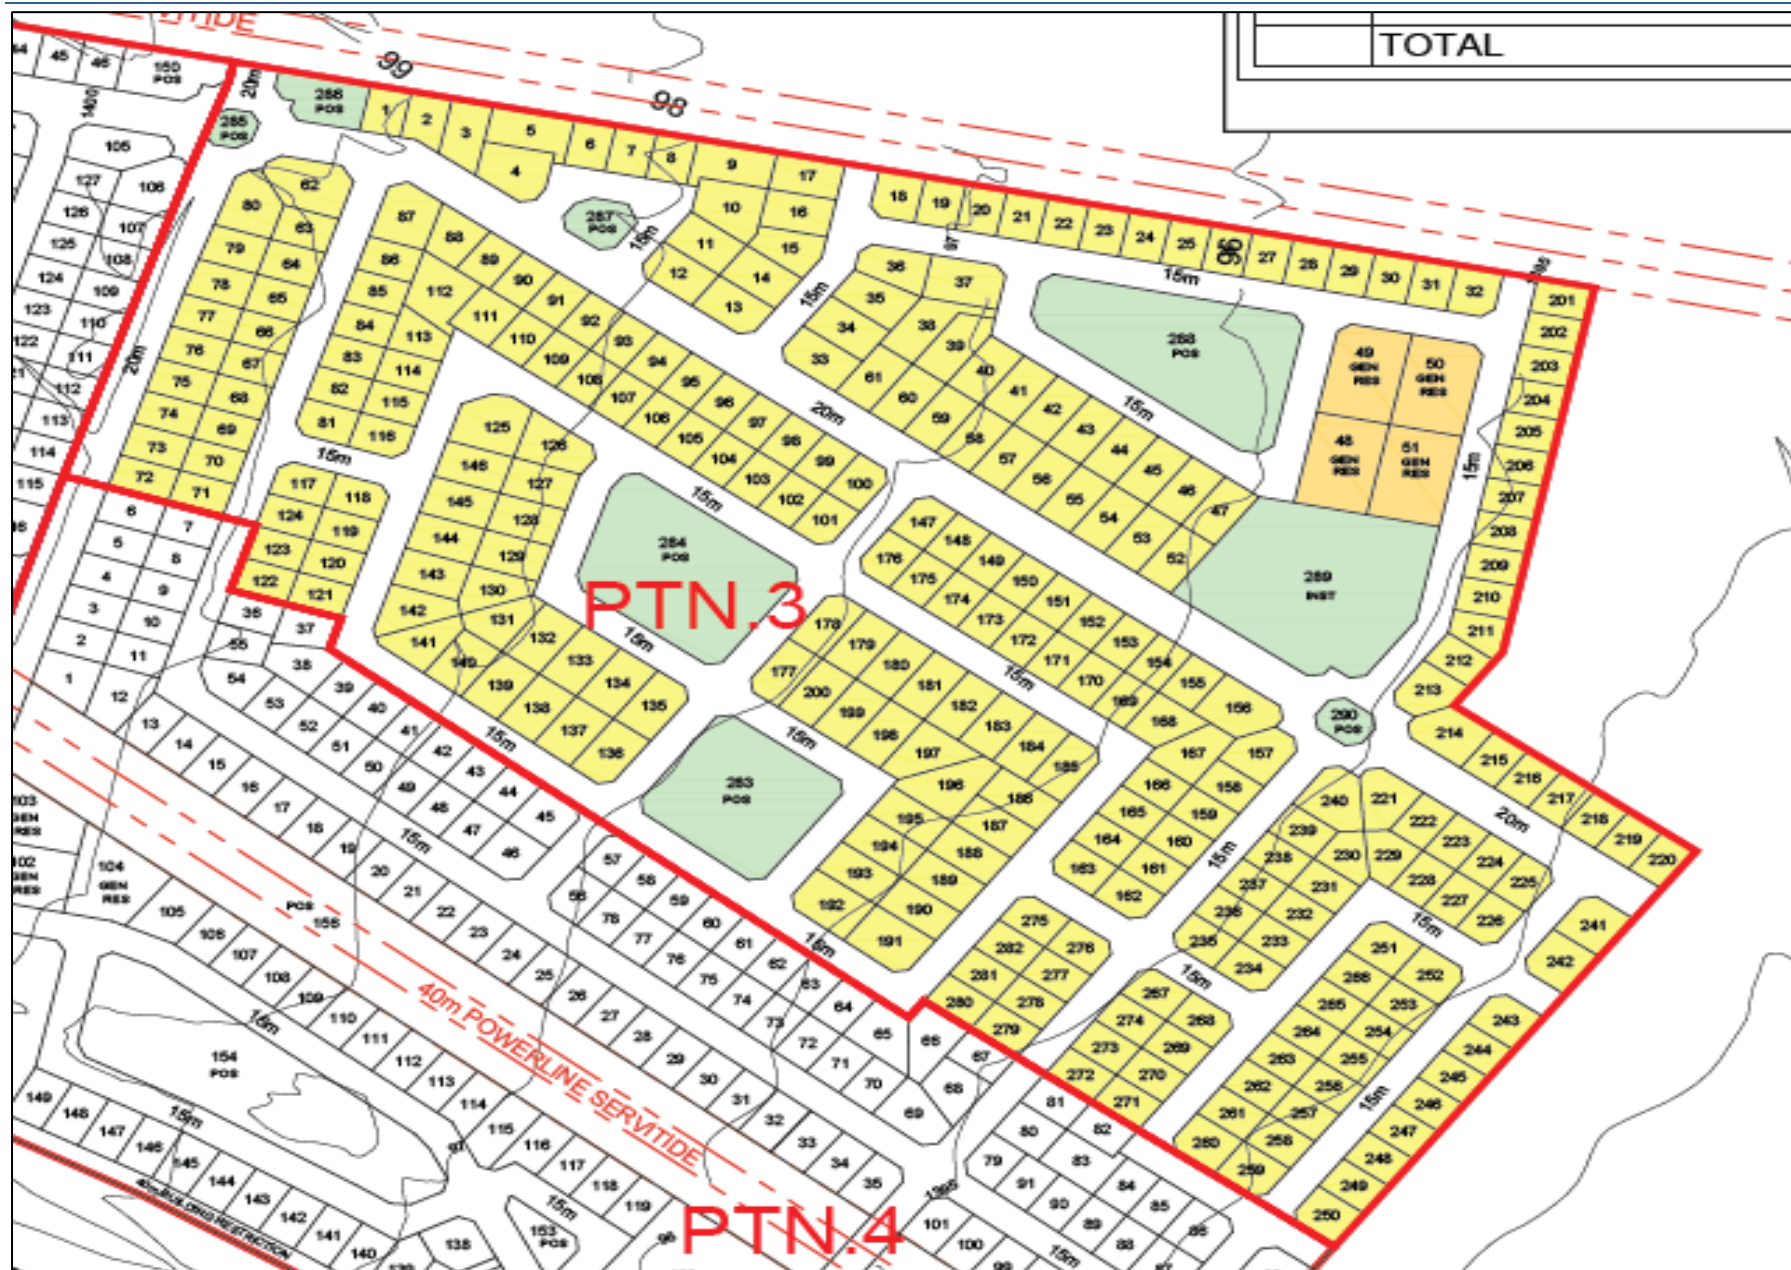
Proposed Layout Plan of Rehoboth Portion 3
